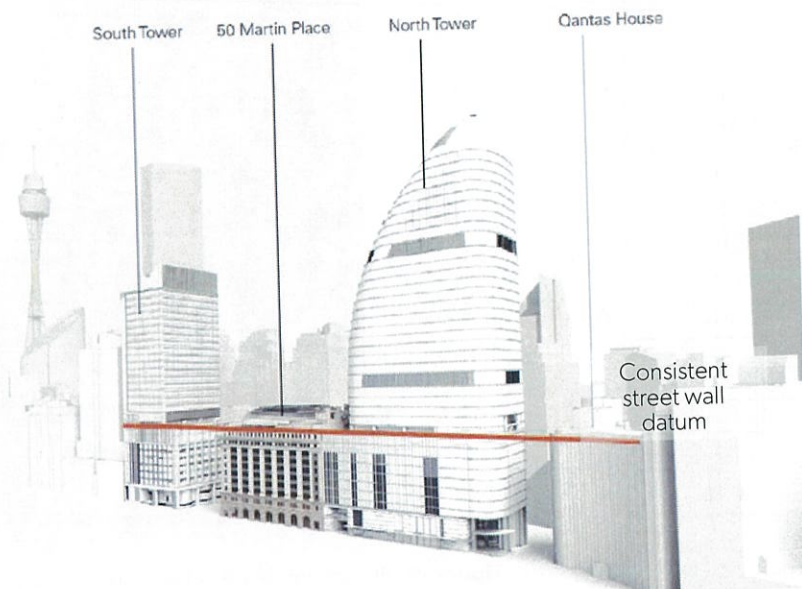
| Modelling of parapet heights along Elizabeth Street (Source: Applicant's RtS)
